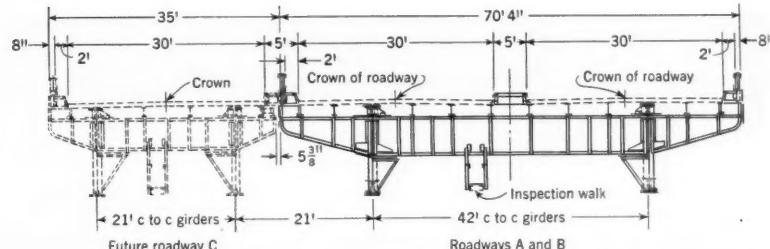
Typical cross-section for Raritan River Bridge shows two 30-ft roadways initially built and position of future third roadway. Two-column bent is used in present construction, but pier base and shaft are designed to receive third column at a later date.
